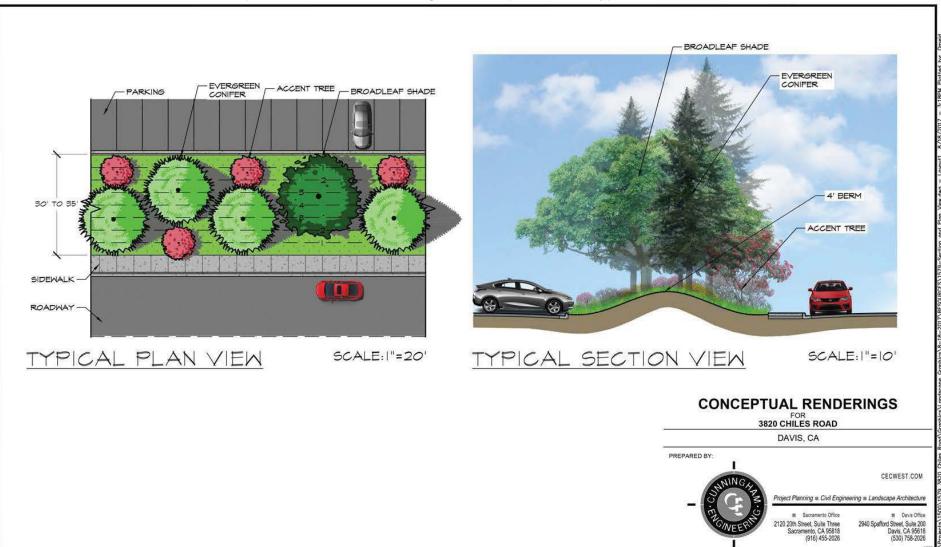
Proposed Chiles Road Frontage Landscaped Buffer: Typical Plan View
